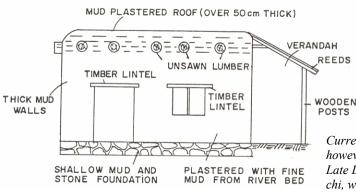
Rural Adobe Dwelling (After Dr. Tanvir Wasti)
